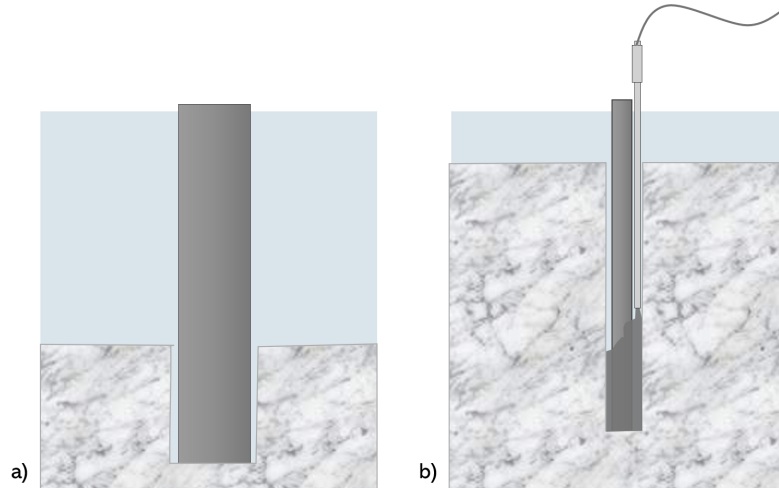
a) Pile - bedrock connection without grout. b) Anchor - bedrock connection with grout.
